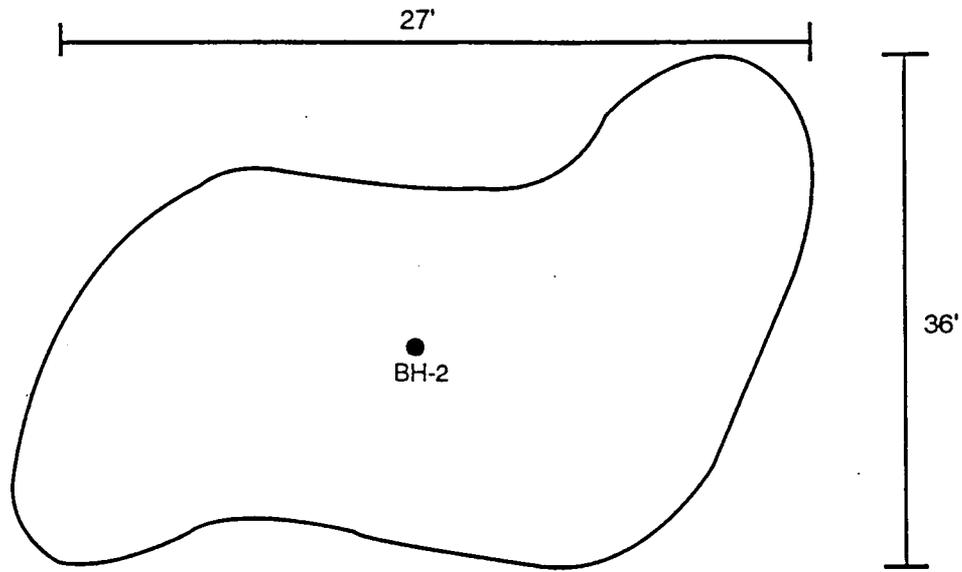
Plan view of Soil Pile D depicting borehole and grid locations, Navy Fuel Farm at NAS Willow Grove, Horsham Township, PA.
